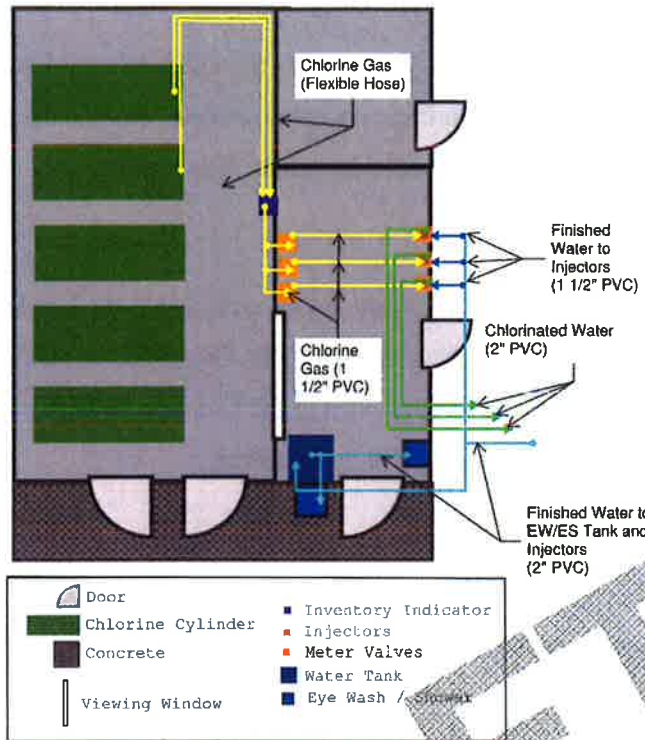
Alternative One Floor Plan General Connectivity Piping Layout
